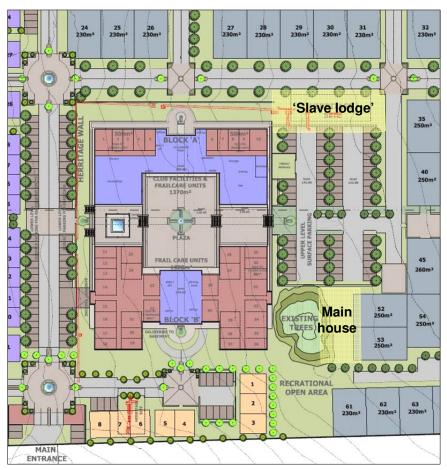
Detail of the site development plan dated Nov/Dec 2009 (See Appendix 4 for plan)
